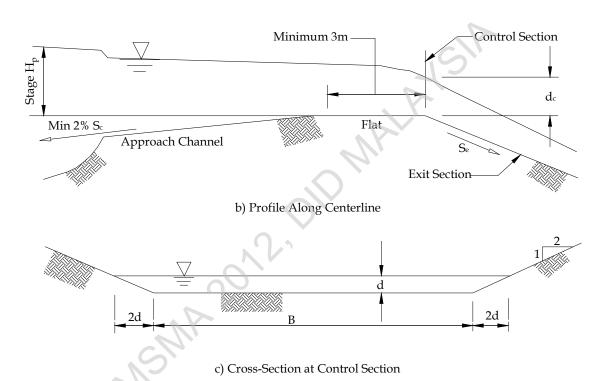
Spillway Design Schematic (FHWA, 1996)
